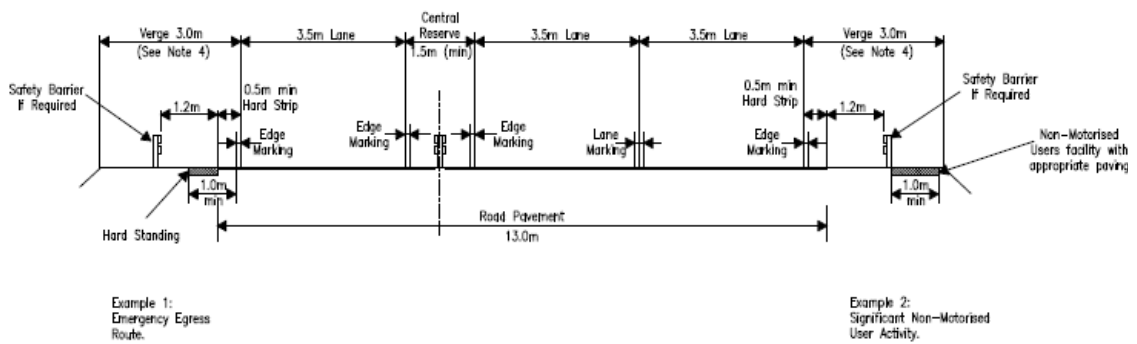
Type 3 Dual Carriageway (Note: Cutting and embankment slopes not shown)
